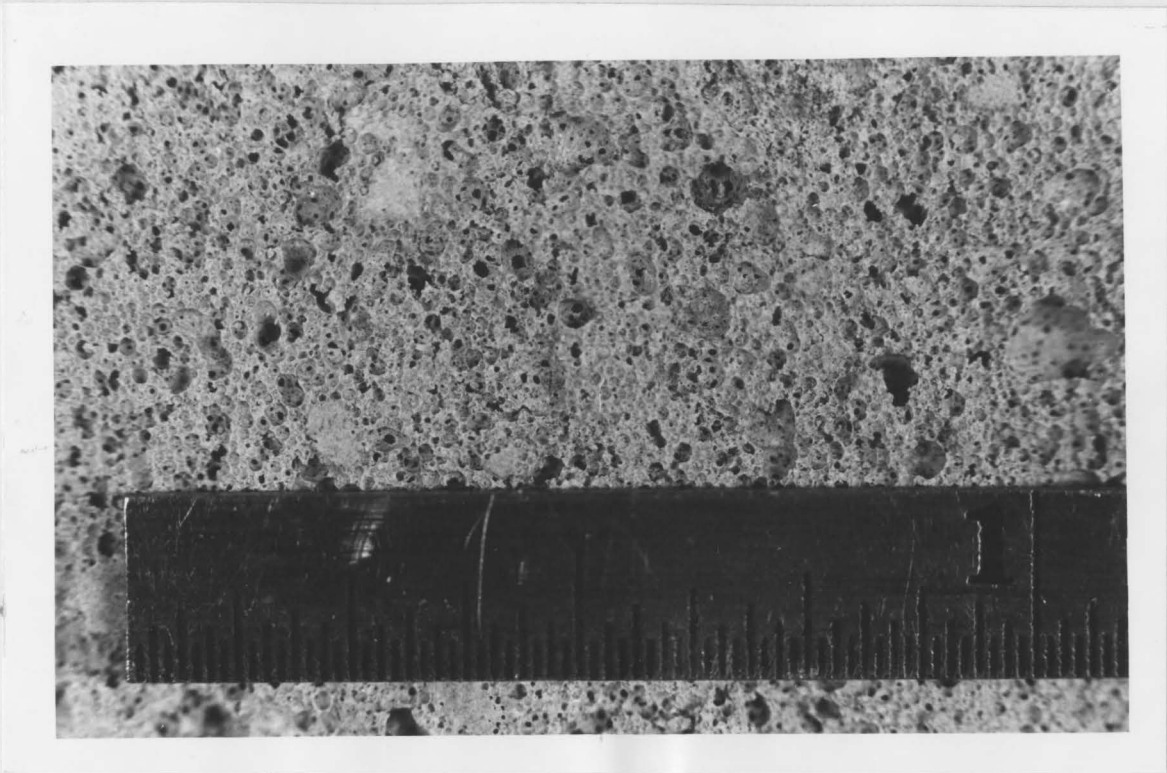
CROSS SECTION OF FOAM CONCRETE
